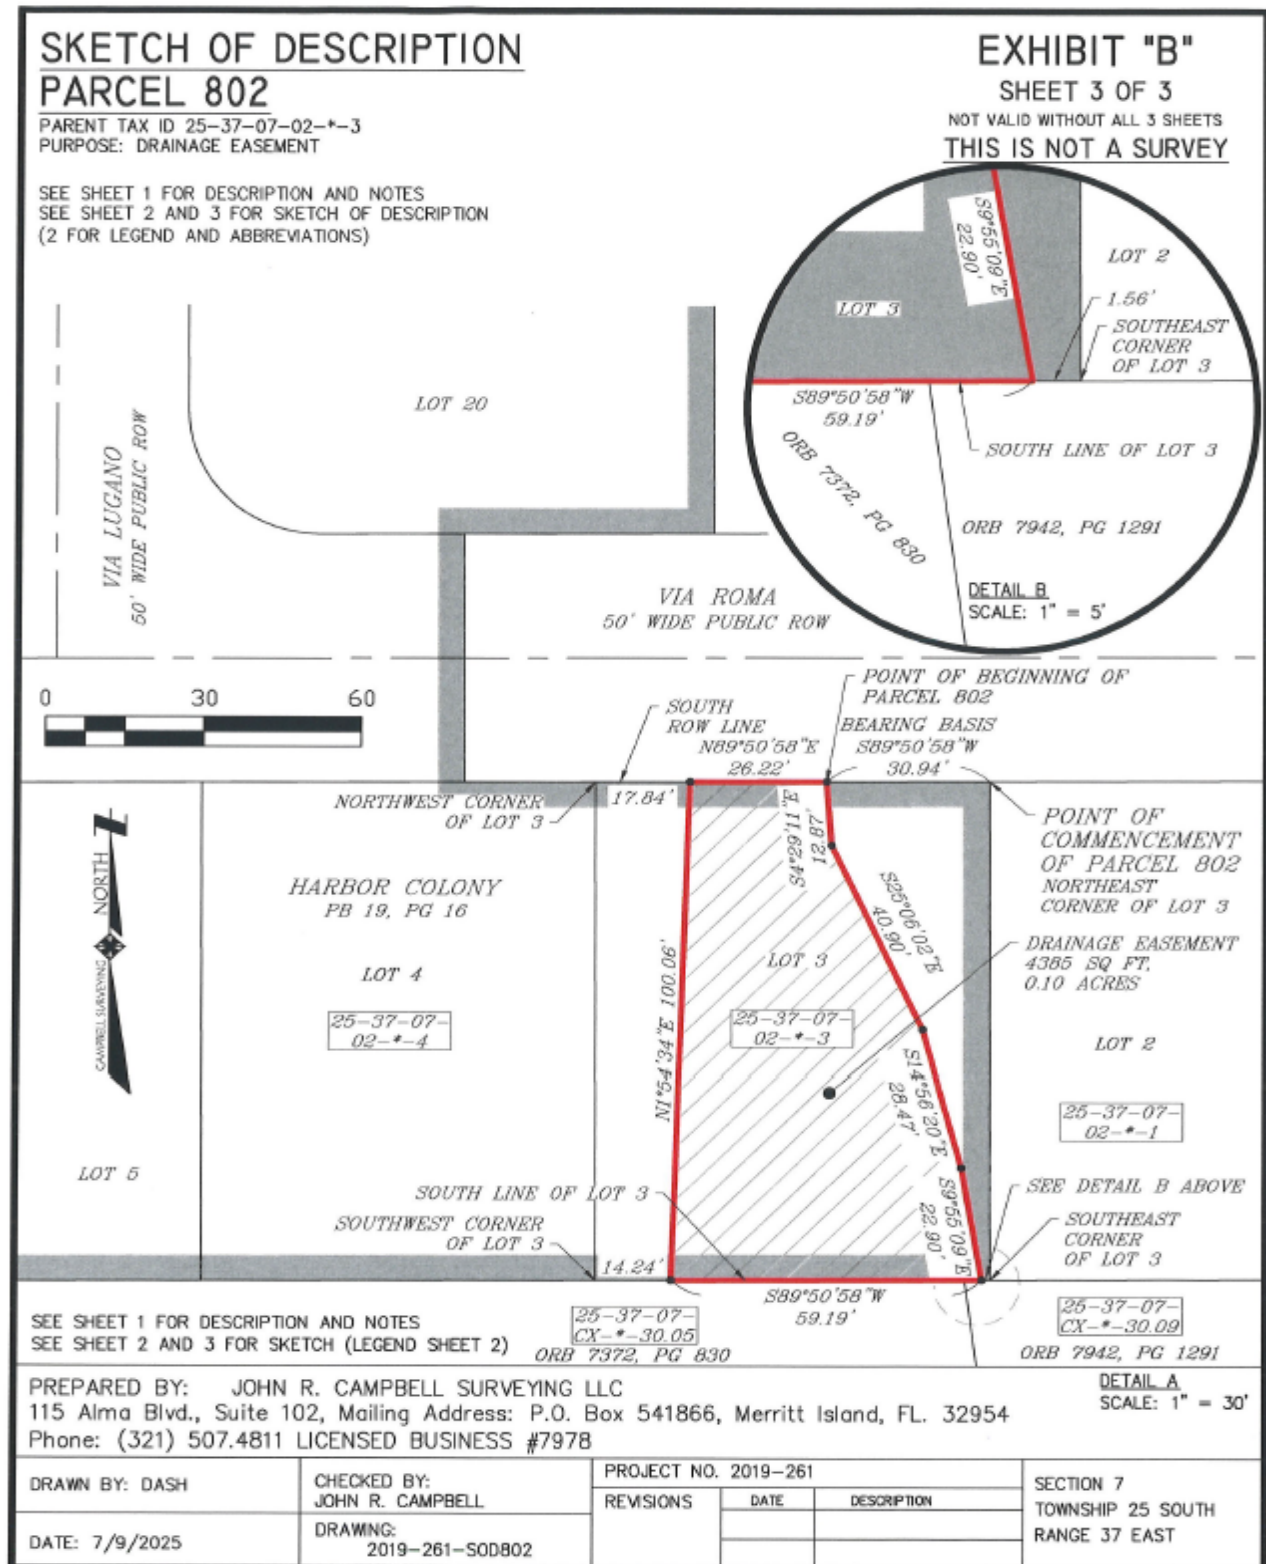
Sketch of Description. Sheet 3 of 3. Section 7, Township 25 South, Range 37 East. Parcel 802, Drainage Easement.
